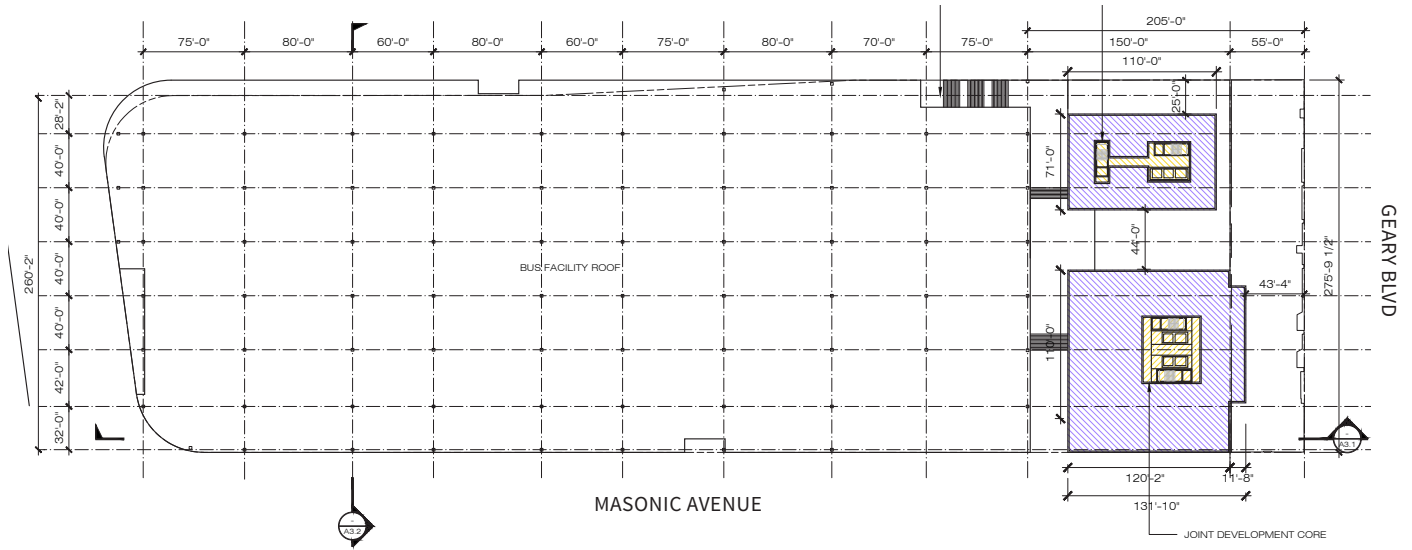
BUS FACILITY CONCEPT DESIGN - ROOF LEVEL
